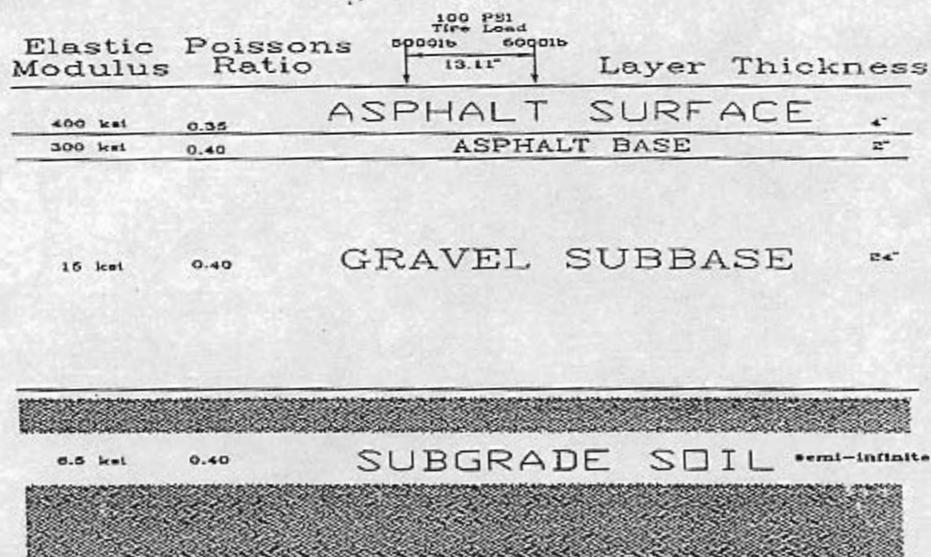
Typical Cross Section of Pavement Structure for the State of Maine
